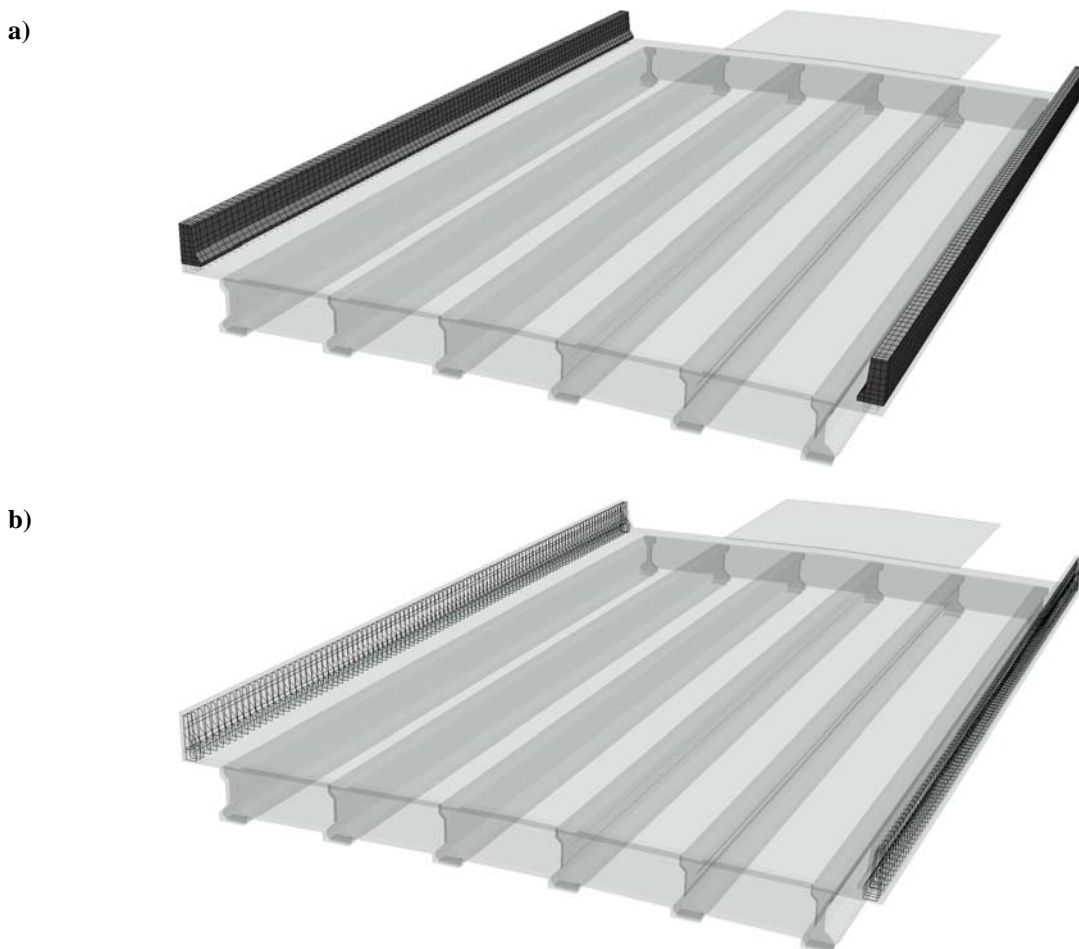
FE model of the traffic railing barriers: a) concrete, b) reinforcement
